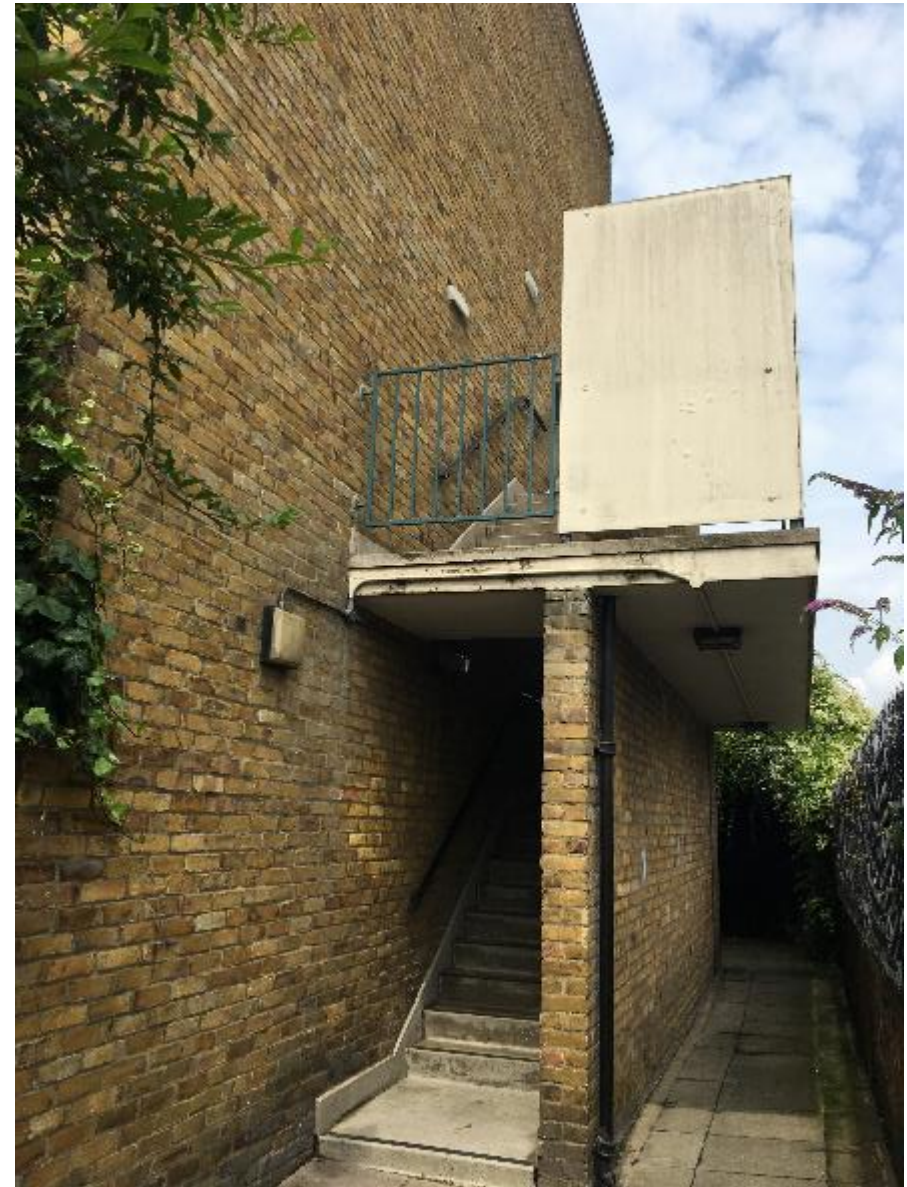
Same steps, note the failed decorations to the concrete landing and assumed cement board guarding.
